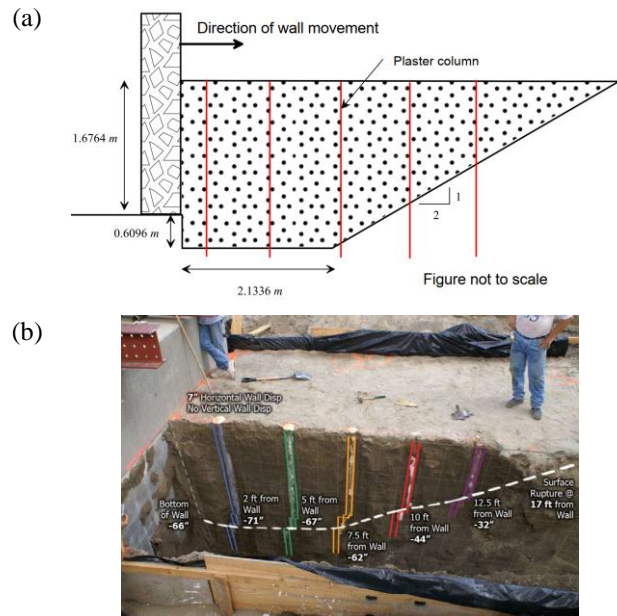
Schematic of the experiment: a) dimensions, and b) failure surface after the test, modified from [7].
